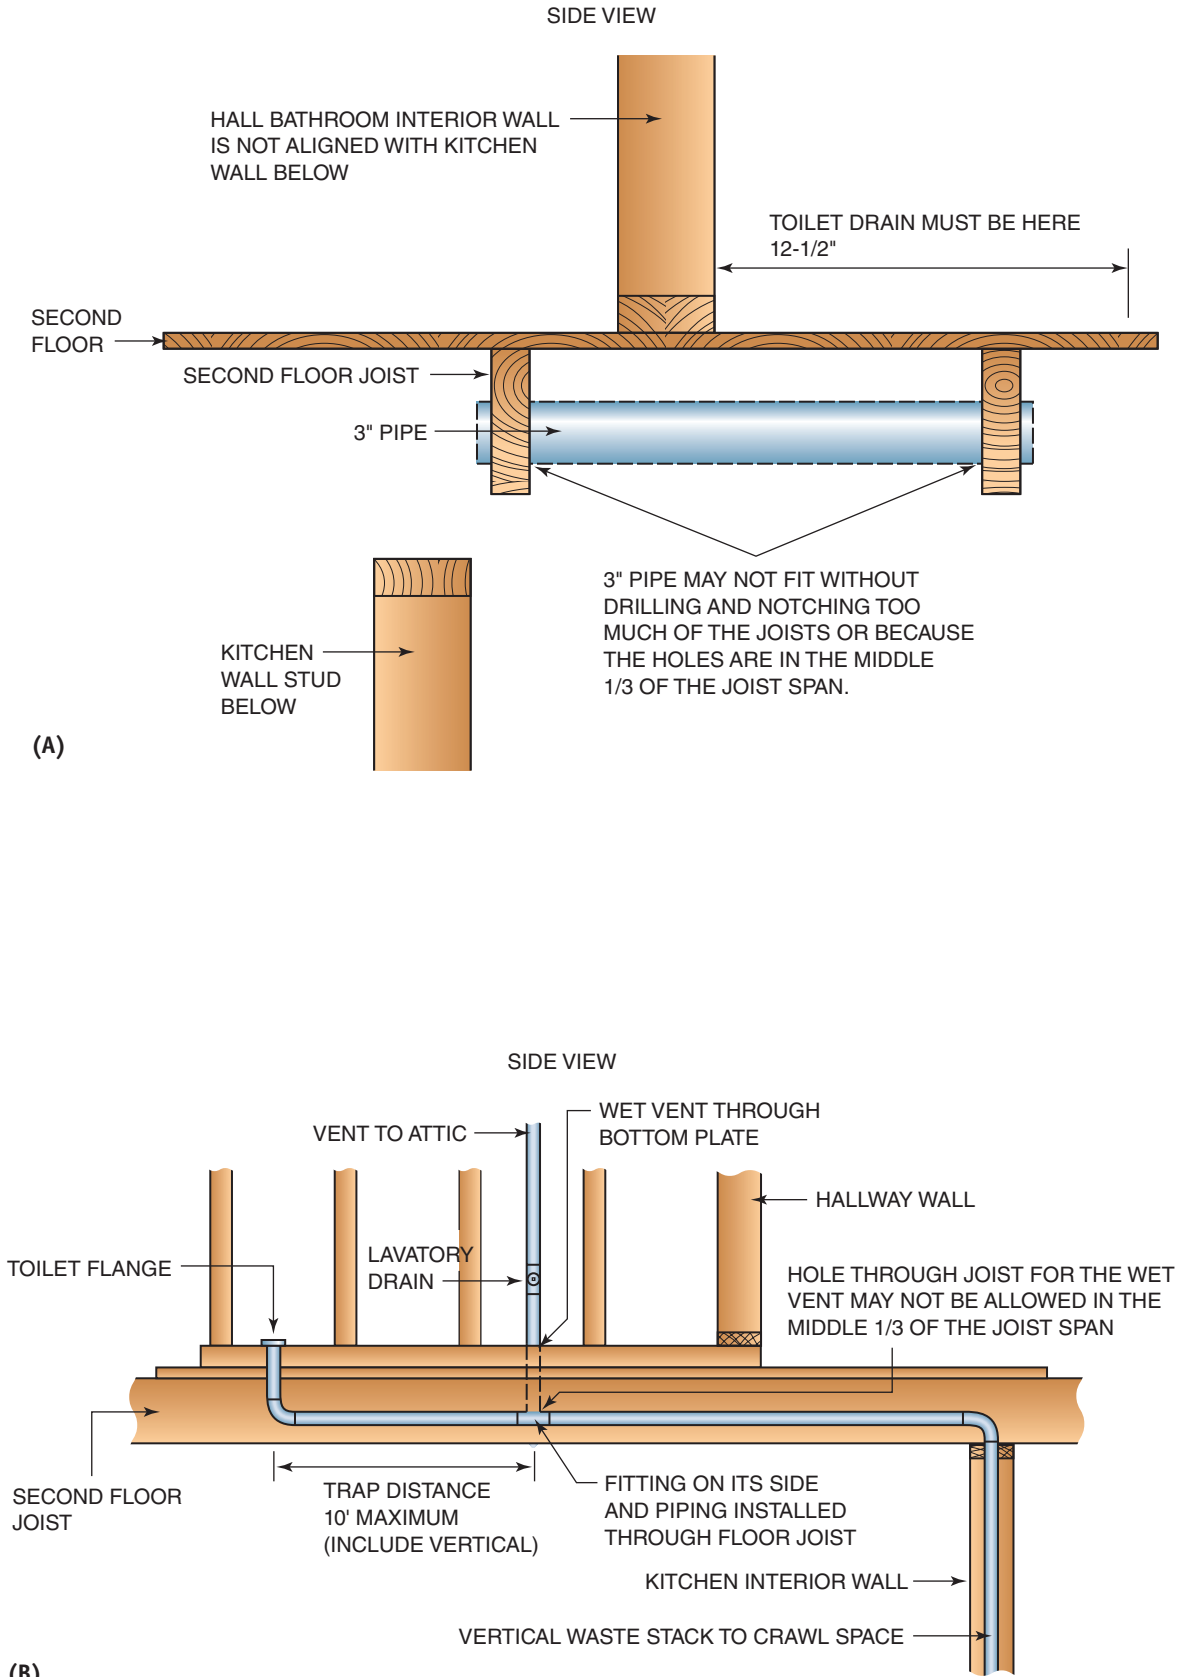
A bathroom group may require separate waste stacks because of structural conflicts.
